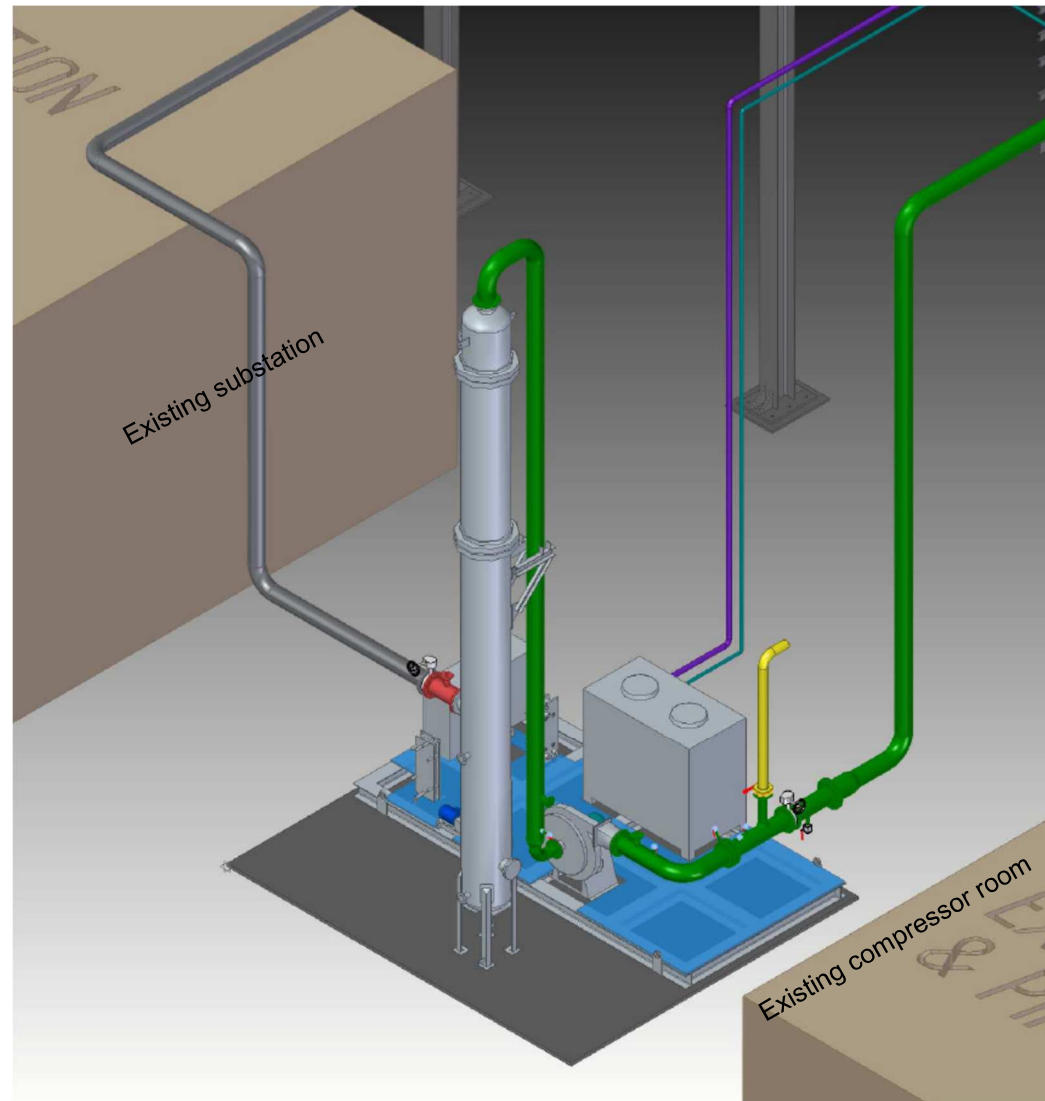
Schematic of Proposed Pre-Treatment Plant at the Factory
